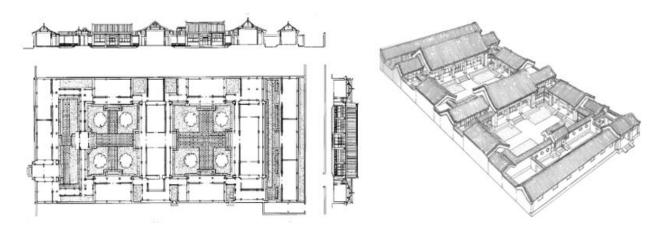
Plan & Sections of Typical Siheyuan (Sun, 2013)
